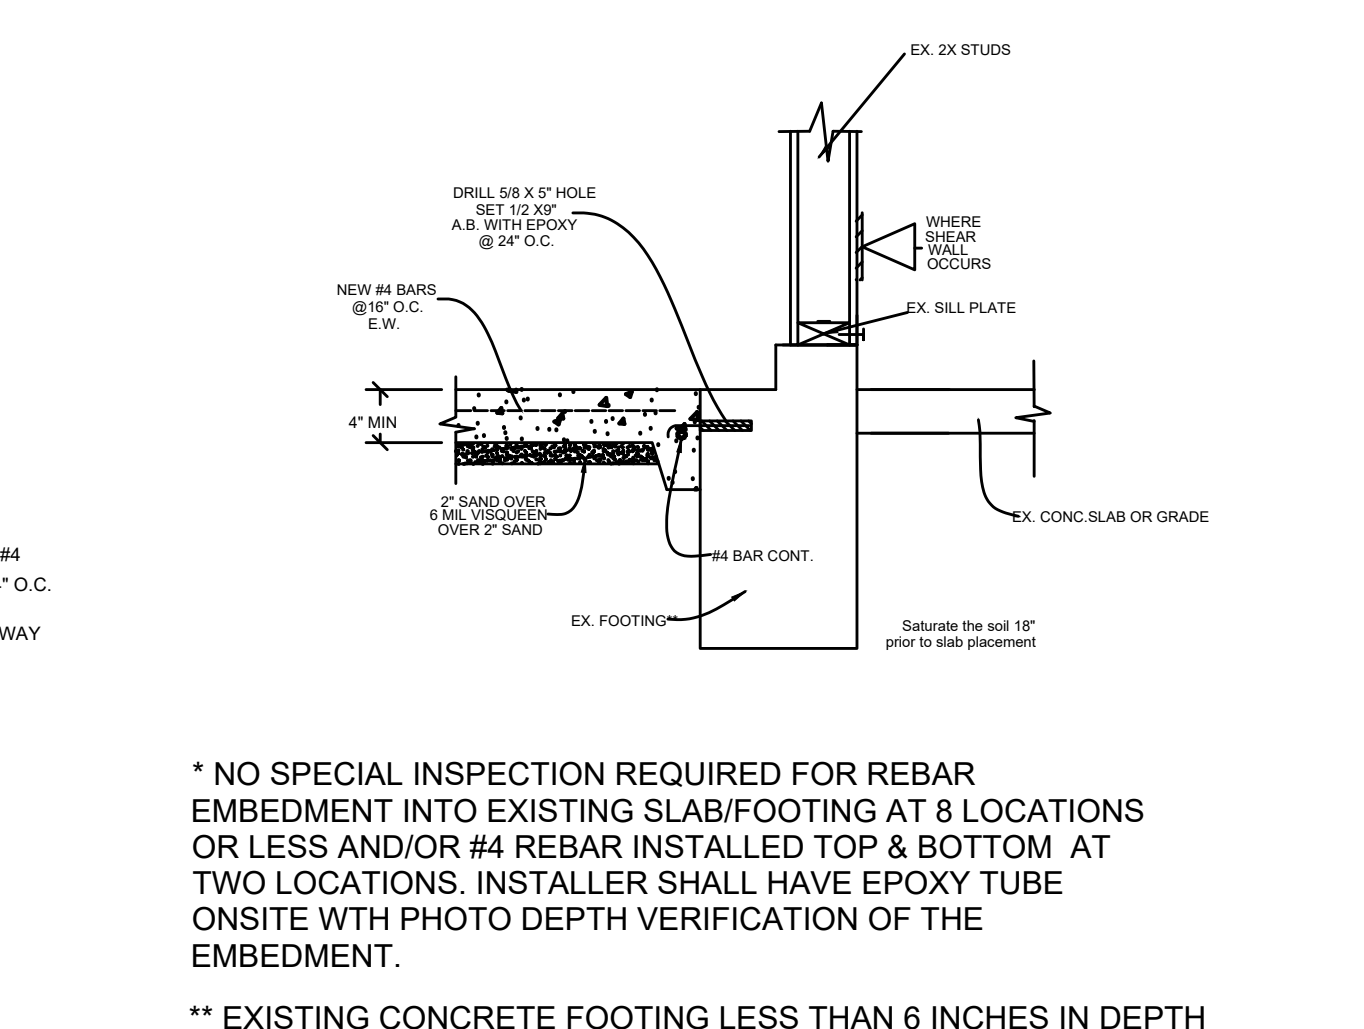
(N) EXTERIOR CONCRETE FOR TERMITE & SILL WOOD PLATE PROTECTION
